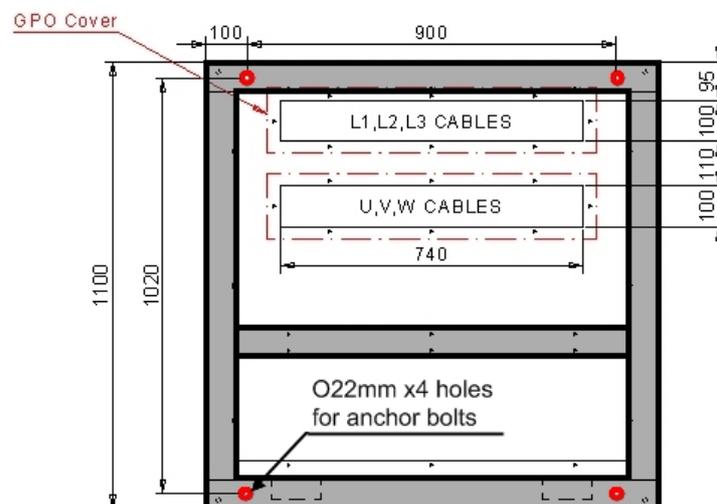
Anchor Bolts Holes Location on the Base of the Cabinet at Level 0mm.
